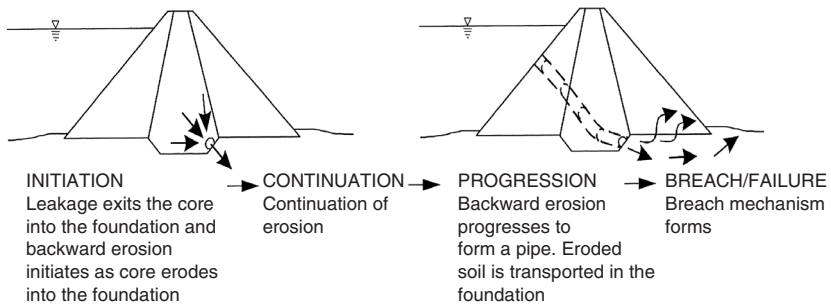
Conceptual model for development of failure by piping from the embankment into the foundation (after [15]).
